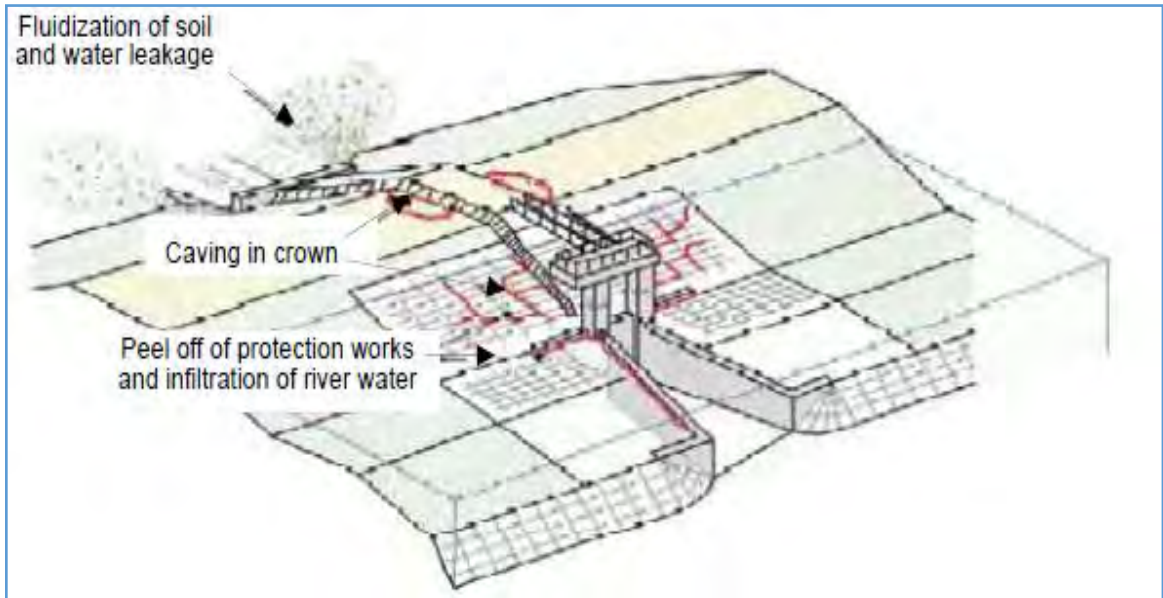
Mechanism and Process of Floating of Drainage Culvert
